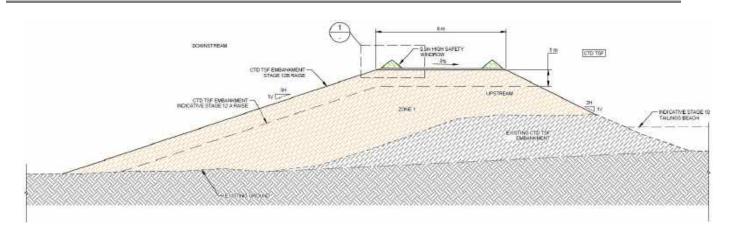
Typical Downstream Raise Construction Profile for CTD TSF Stage 12A and 12B
